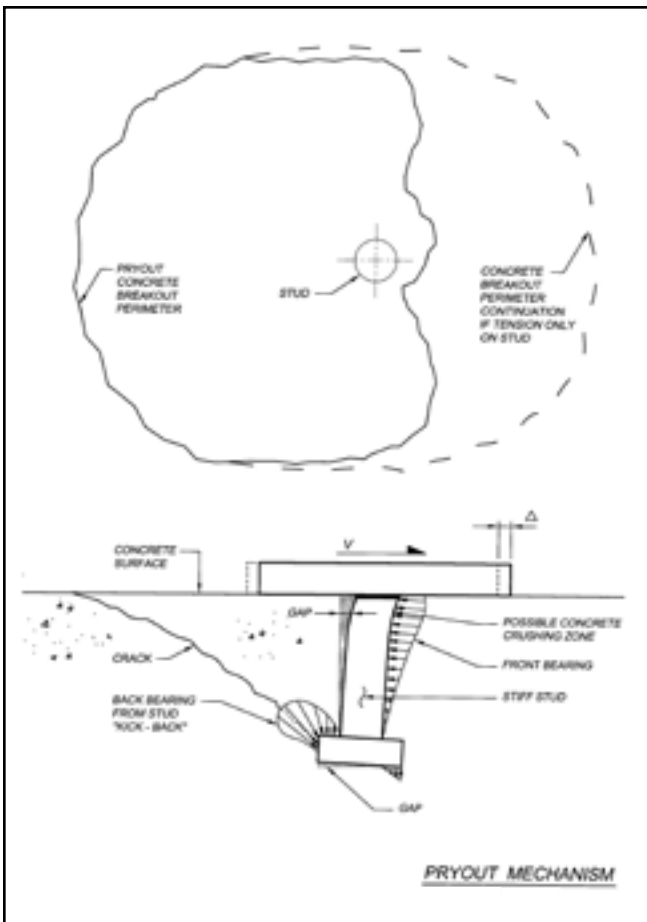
Plan and cross section of the pryout behavior mechanism in a concrete member.
